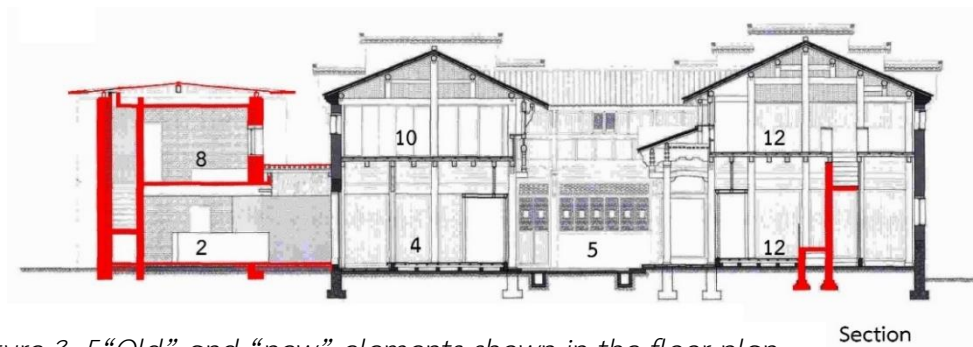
“Old” and “new” elements shown in the floor plan.
